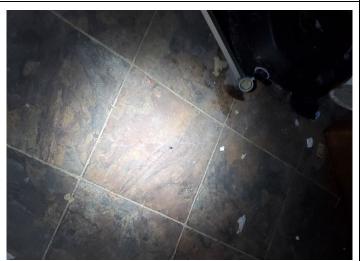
Brown/Gray marble roll vinyl located in hallway and hallway bathroom.
